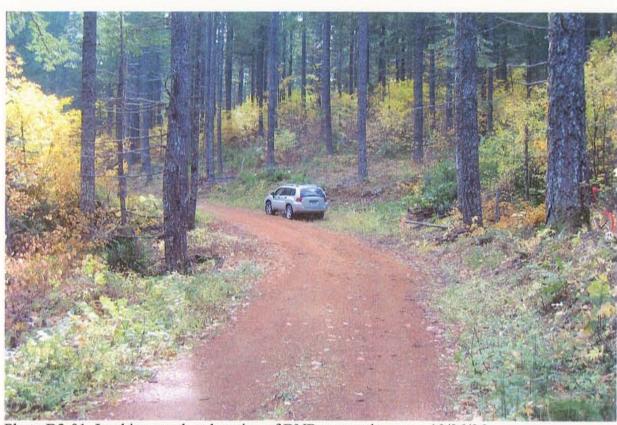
Looking south at location of DNR-mapped stream. 10/26/06.
